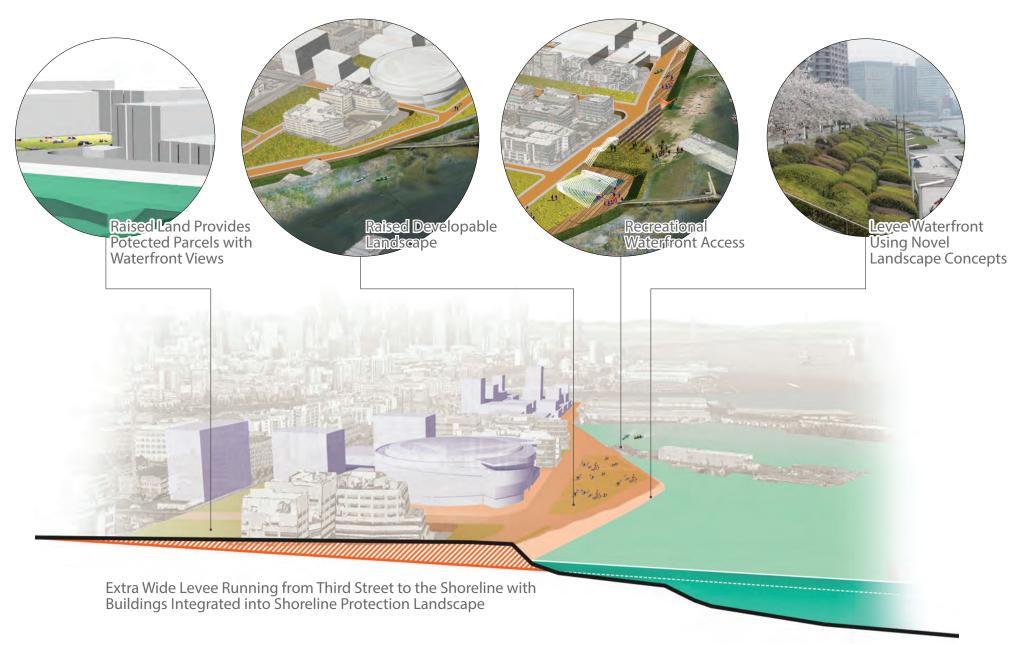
BAY SHORELINE CONCEPT 2 OPPORTUNITIES AND DETAILS
